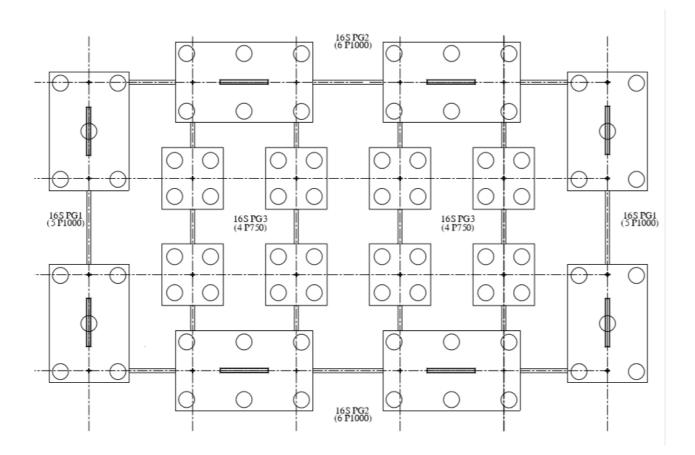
Pile layout plan for 16 storeyed building in seismic Zone IV.
